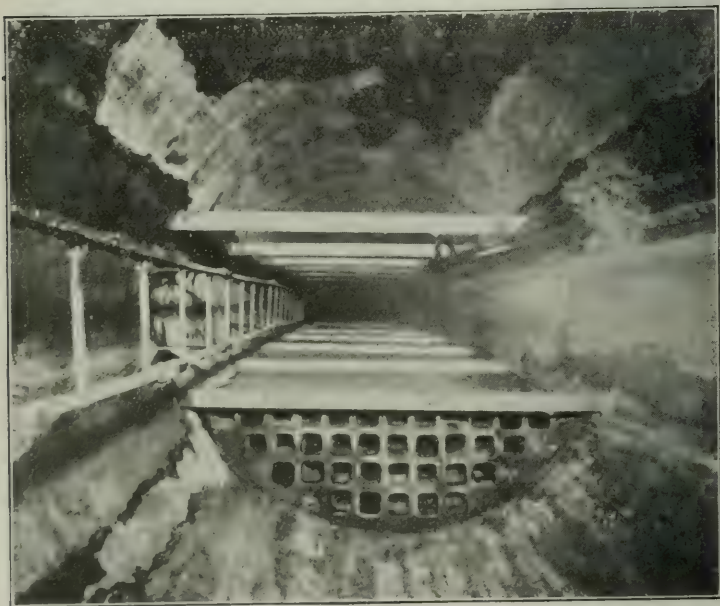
Quarry St. Tunnel Shaft, Plastered.
